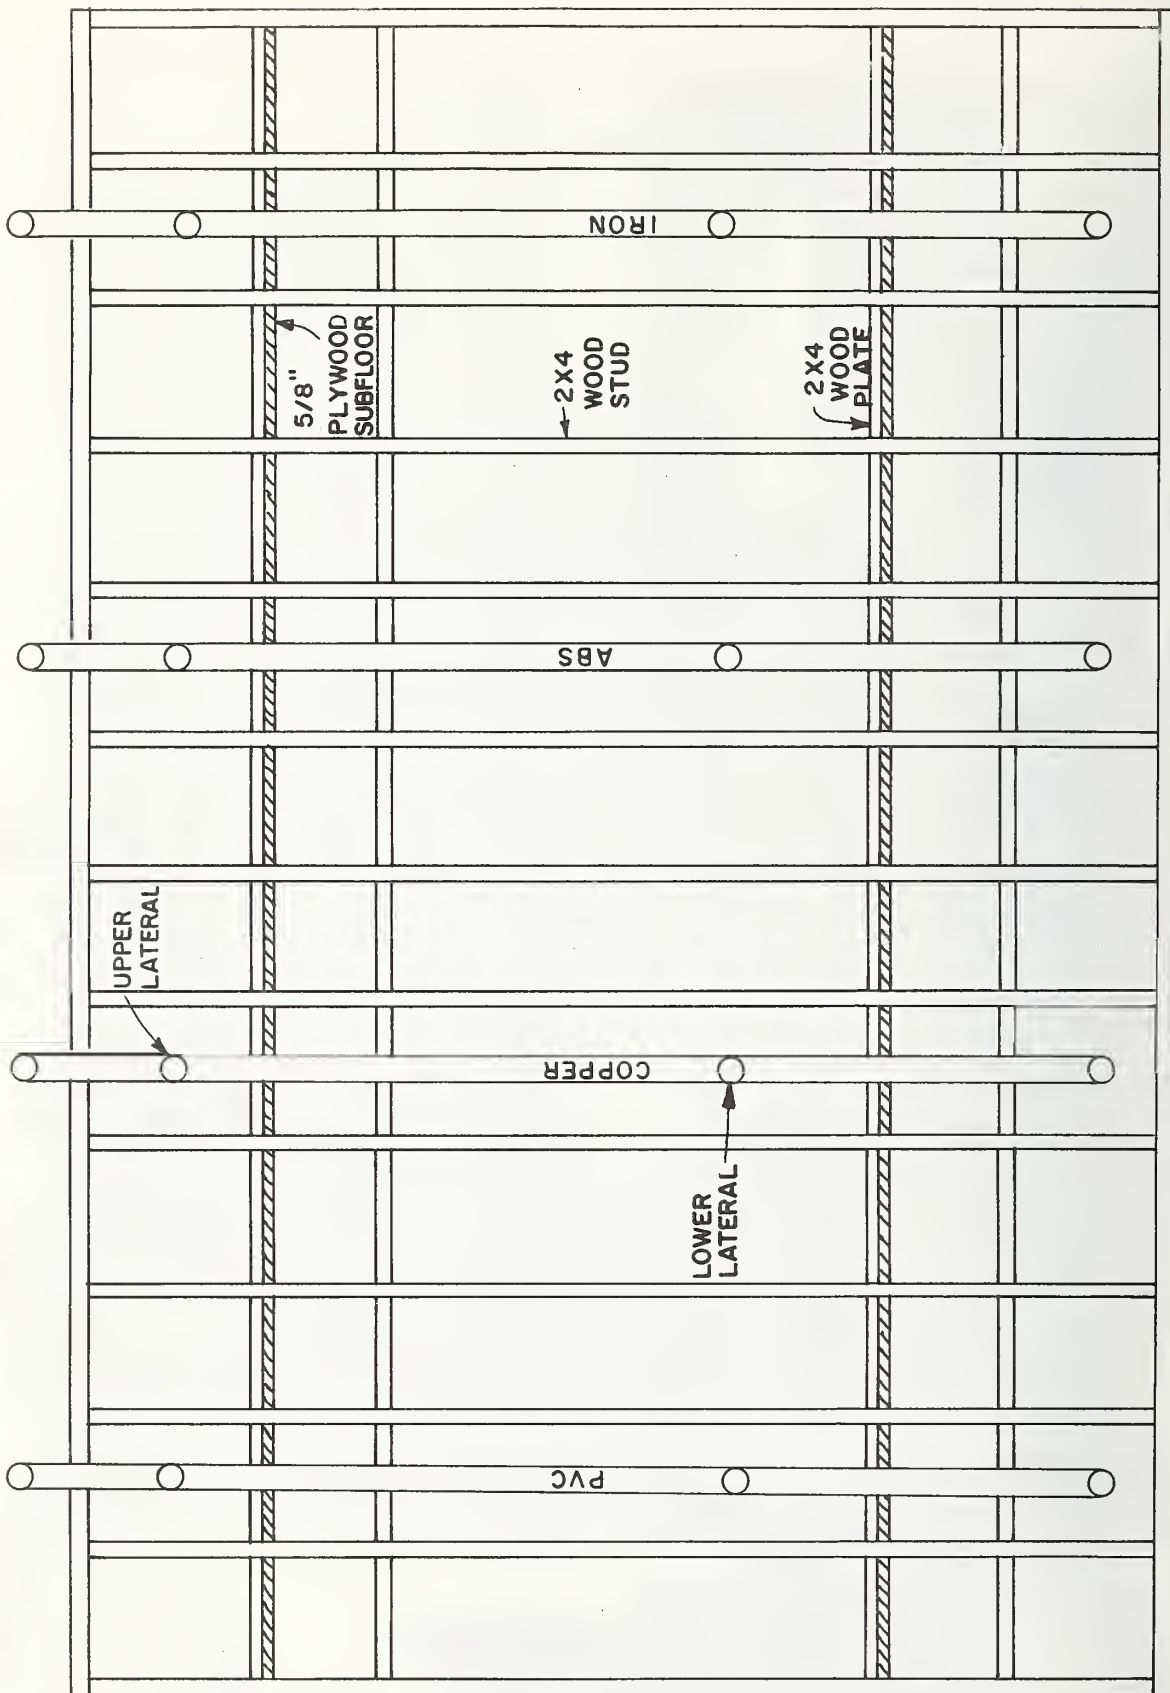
Wall Construction and Location of Stacks on Test 3.
